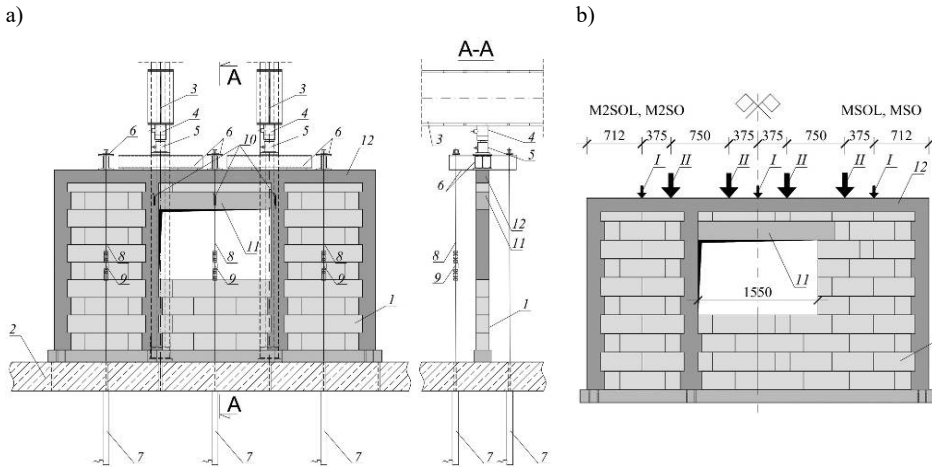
a) test stand, b) loading scheme. Notations: 1 – AAC masonry units, 2 – reinforced concrete slab, 3 – steel frame, 4 – hydraulic actuator, 5 – dynamometer, 6 – crossbeams, 7 – piston jacks, 8 – steel tendon, 9 – dynamometer, 10 – LVDT, 11 – lintel, 12 – tie-beam and tie-column, *I* – force caused by piston jacks – auxiliary loading, *II* – force caused by hydraulic actuator – a half of main load. *Source:* the authors' own study
